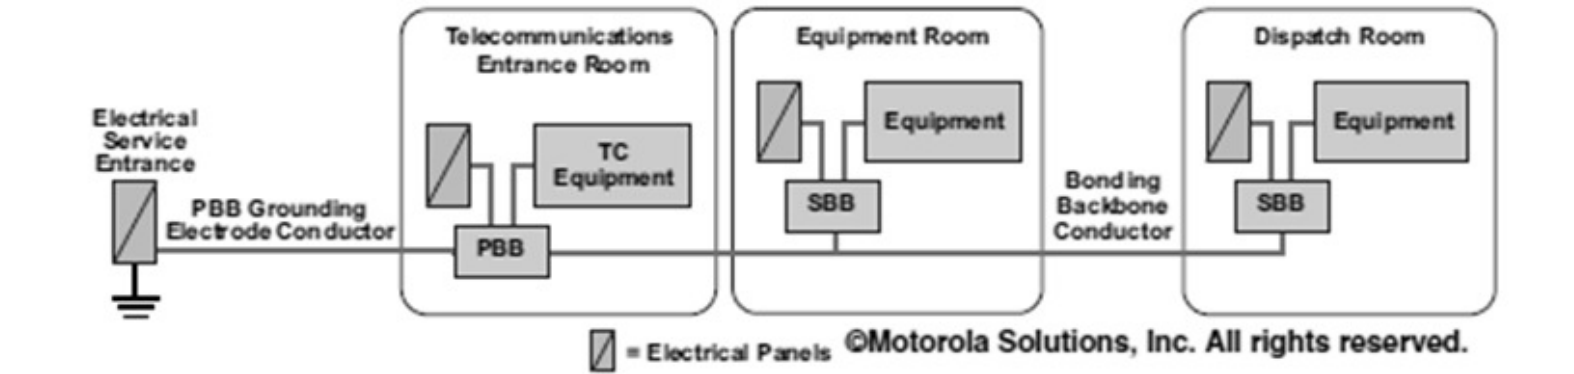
Example of Internal Bonding and Grounding System for Single-Story Large Commercial Building
